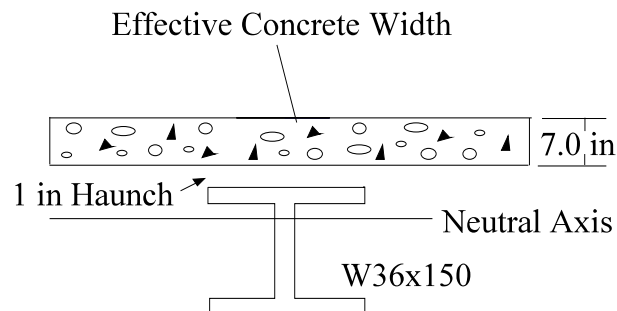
Composite Concrete Bridge Deck, Detail No. 4
